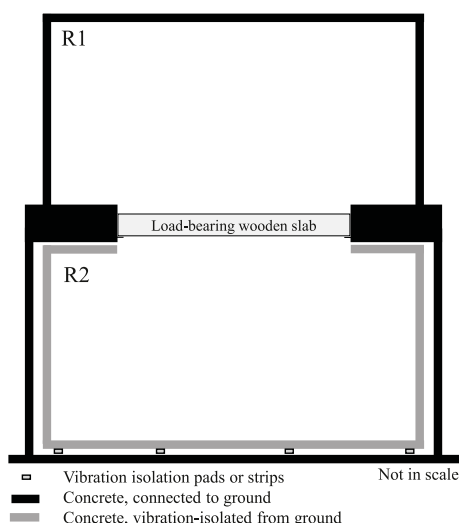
Principal section drawing of the impact sound insulation laboratory.
